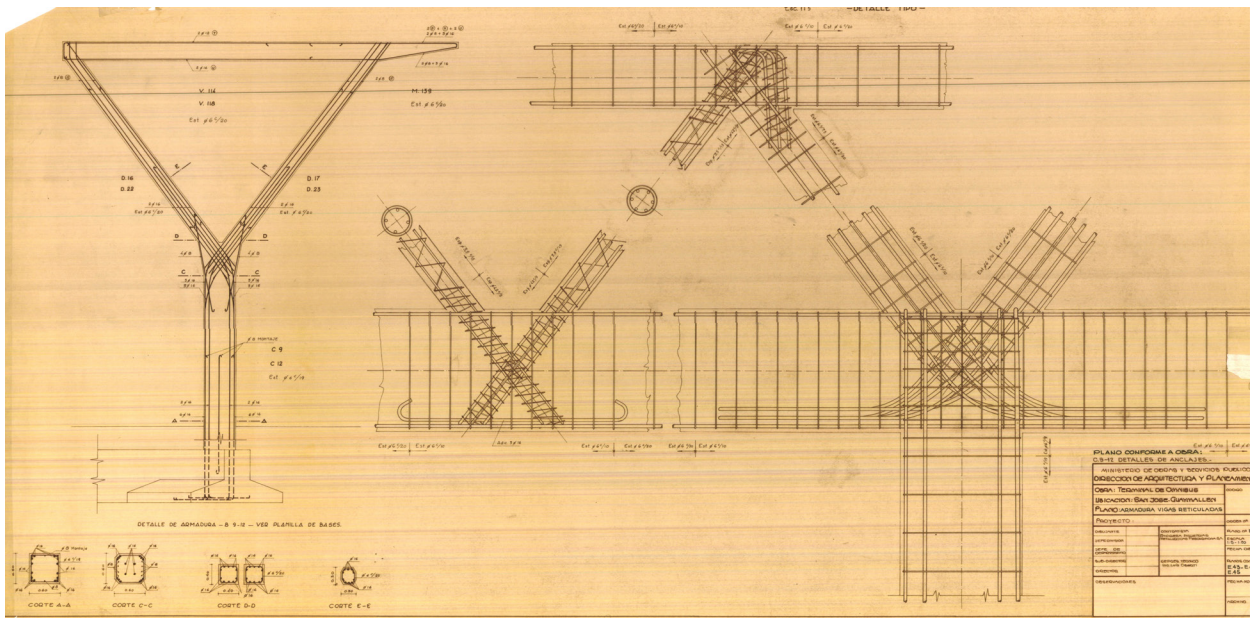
Detail of the reticulated beam trusses. Source: Digital Archive of the DAI-MIIP, Government of Mendoza.
